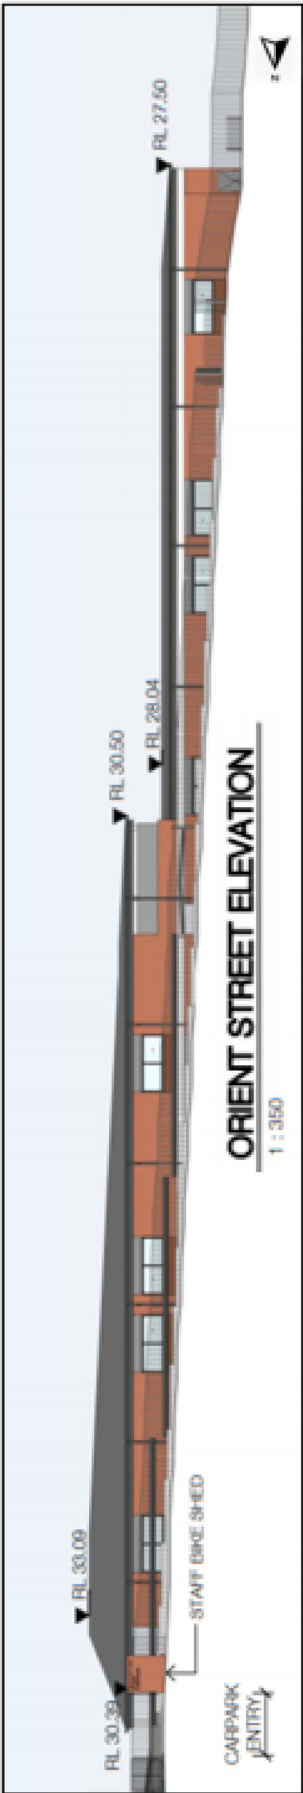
| Orient Street elevation of Building 4 (Source: EIS 2021)
